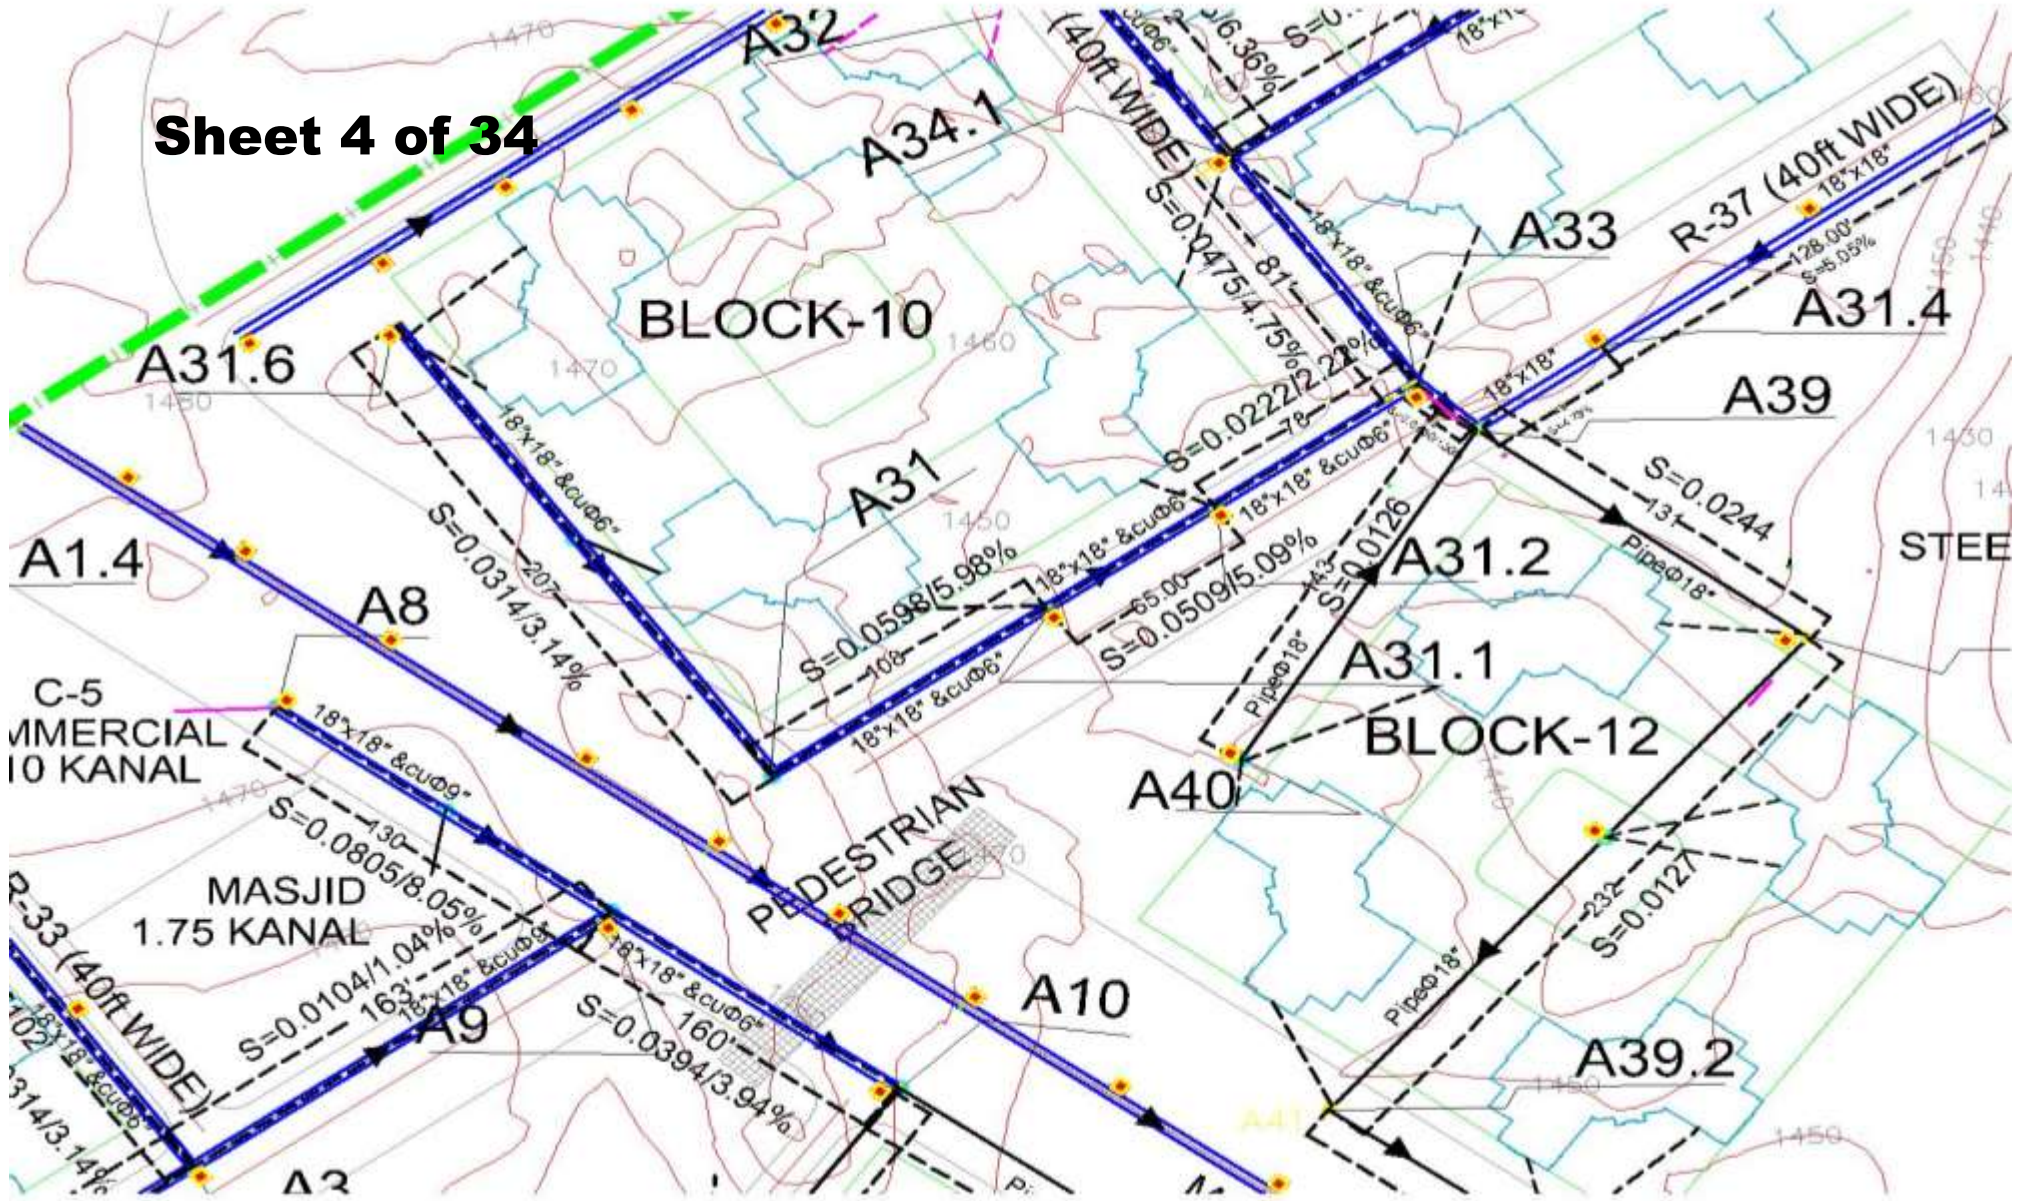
Combined drainage layout plan of Zone-1 at L/S of MR-01
